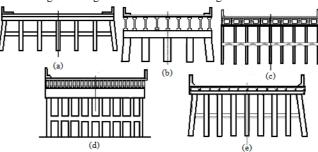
(a) Cross section of slab-type bridge, (b) I-girder bridge, (c) Prestressed box-beam bridge, (d) Prestressed multi-beam bridge and (e) Prestressed plank-girder bridge
